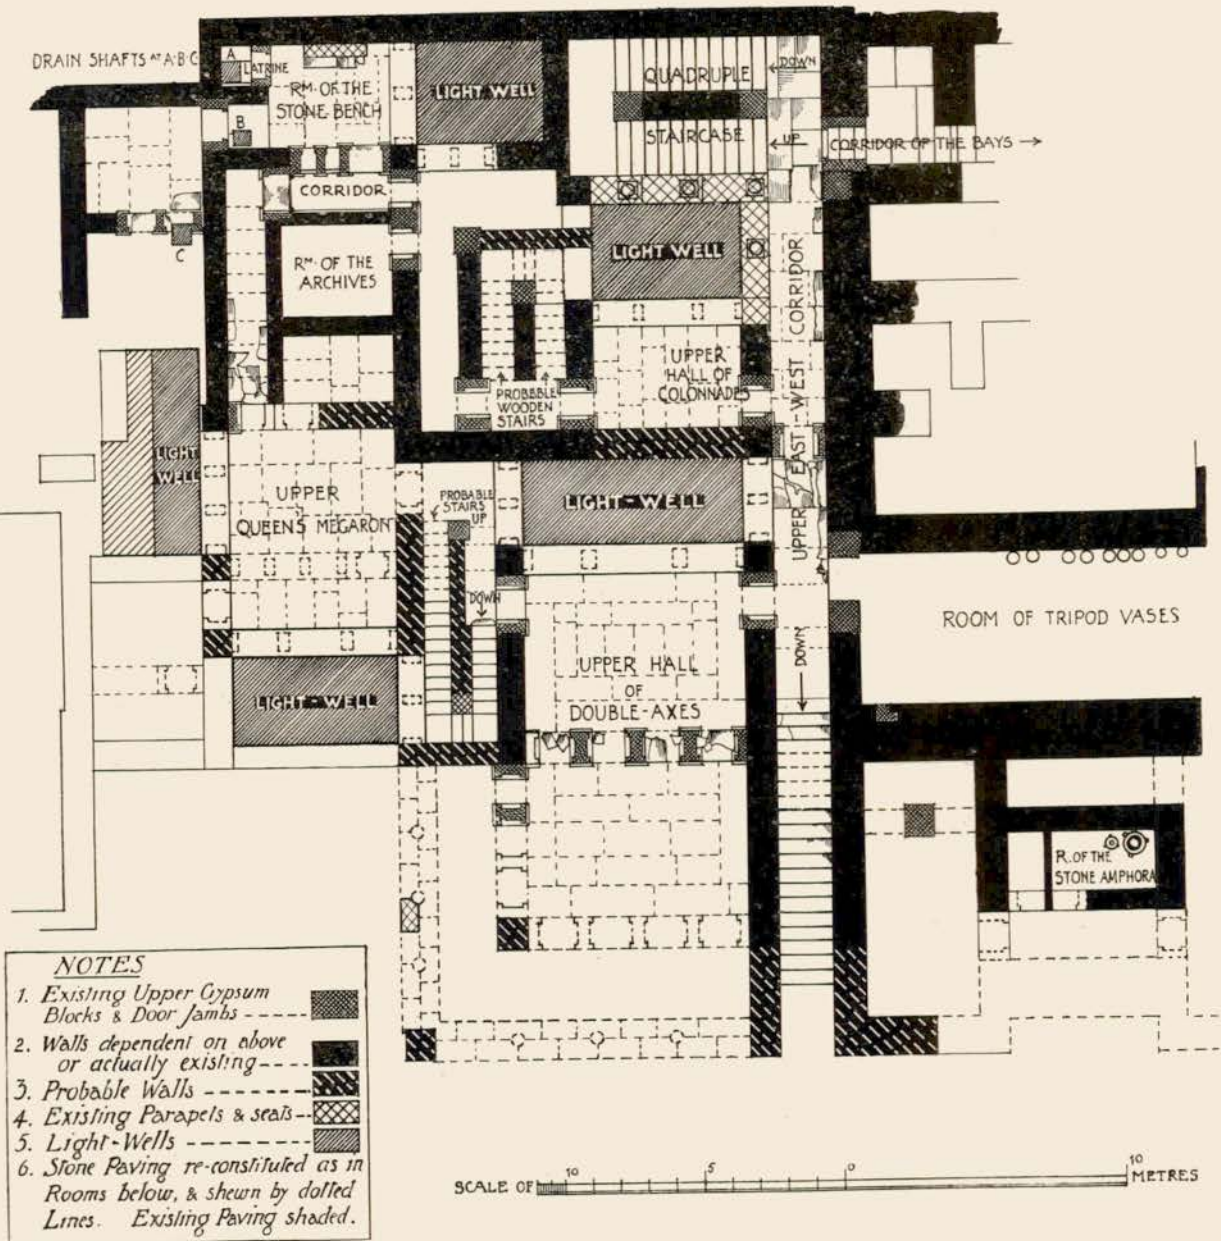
UPPER FLOOR PLAN OF DOMESTIC QUARTER AND ADJOINING HALLS.
